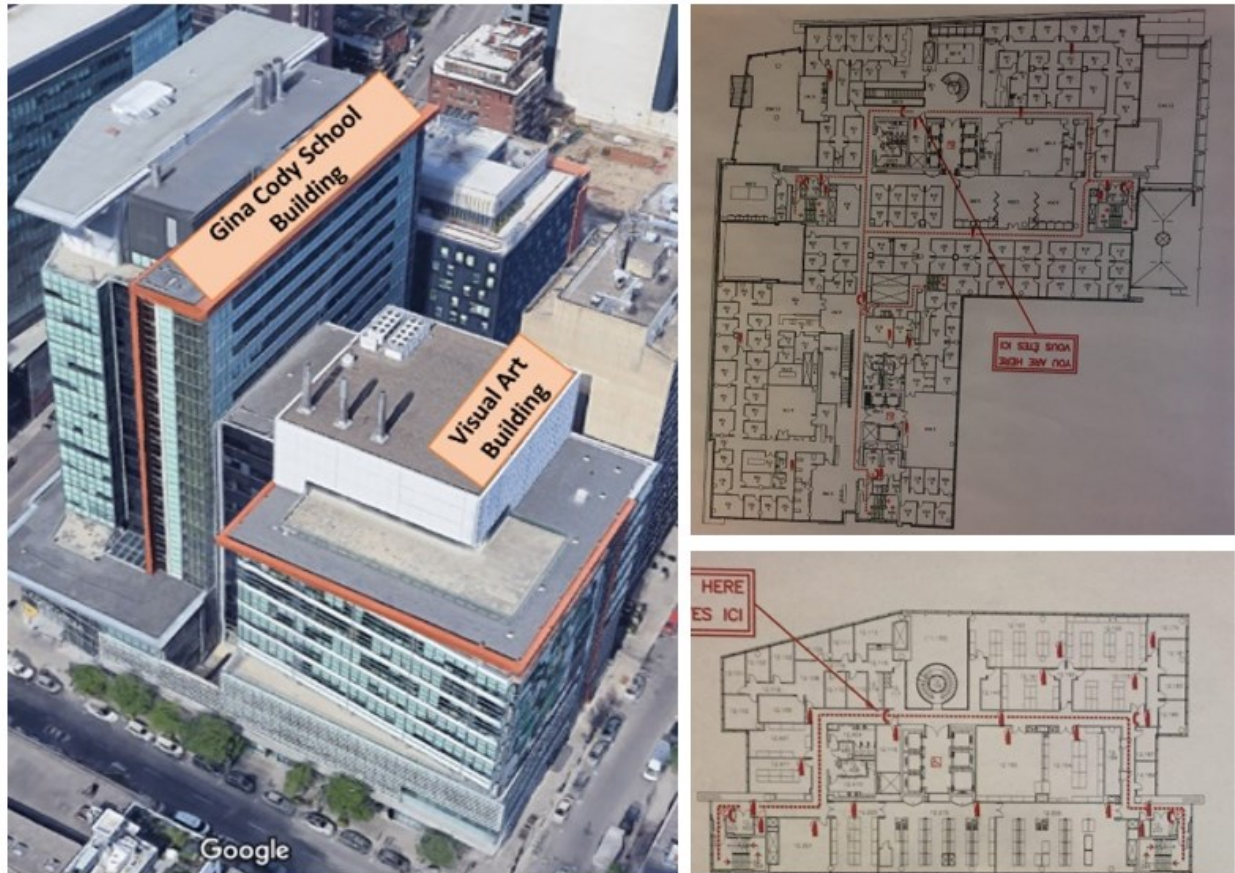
1. The Isometric view of EV Building, Concordia University (Source: Google Map) (left), typical floor plan of EV building at the lower stories (top right), typical floor plan for the higher stories (bottom right). The courtesy of the right pictures belongs to Concordia university.
